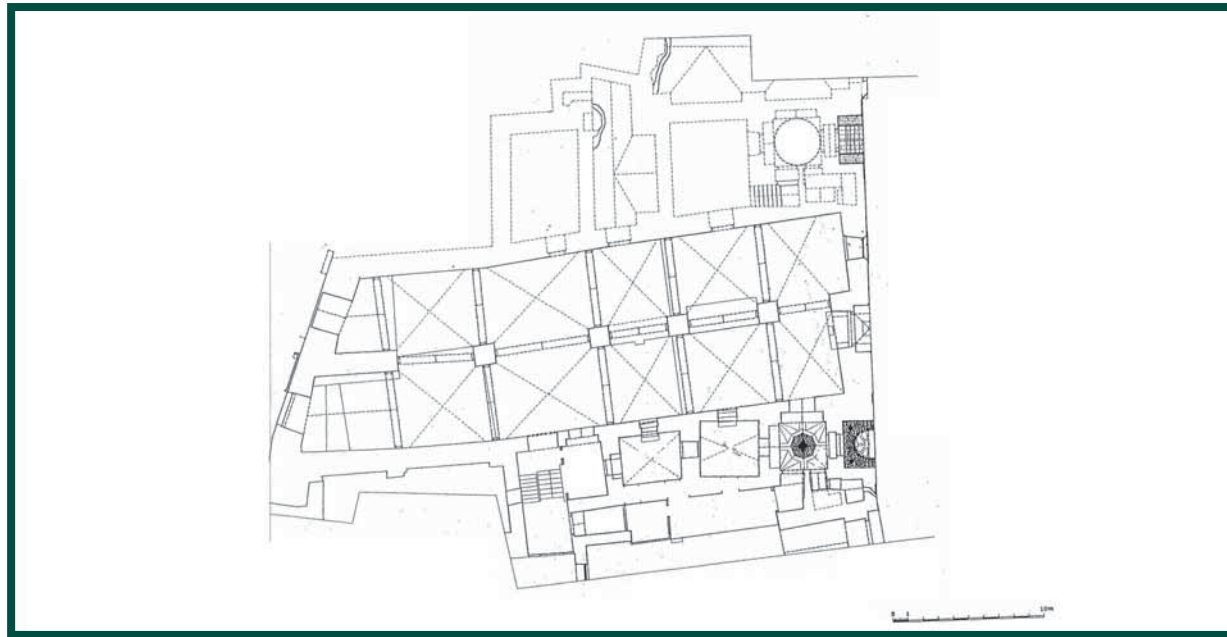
Plan of Ground floor of Dar al-lytam al-Islamiyya Complex
